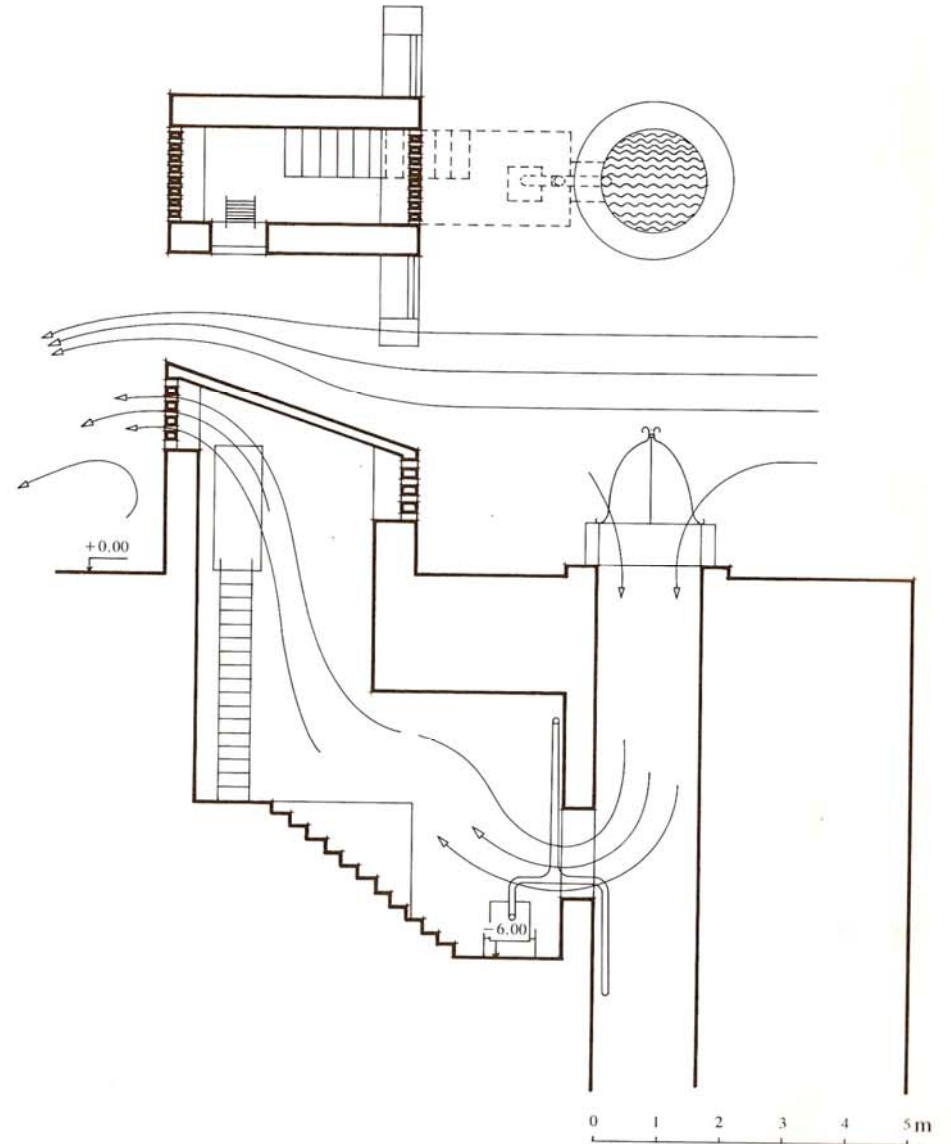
Plan and section of the pump room of the Sidi Krër house, Alexandria, showing the ventilation generated by the wind-escape. Design by Hassan Fathy. (See p. 56.)
